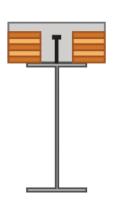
Steel-Concrete-Timber Composite Section (Barber et. al, 2022) Copyright © American Institute of Steel Construction
